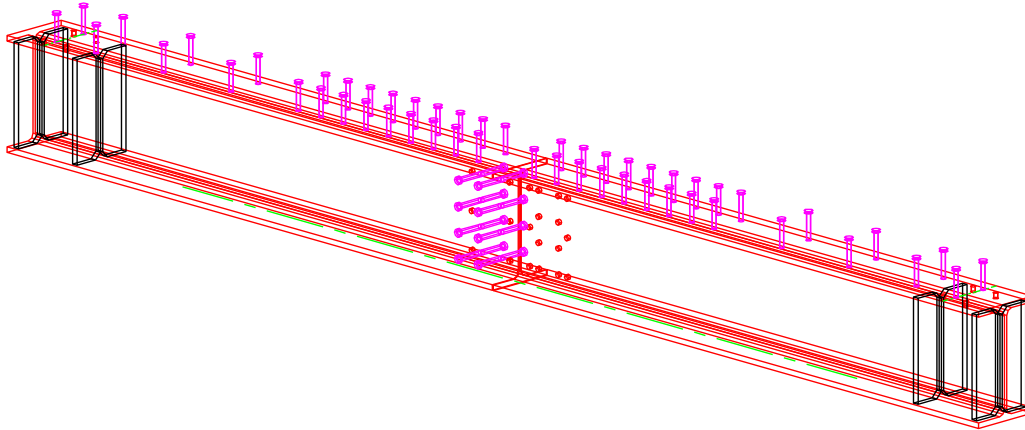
3D view of the steel part of the specimen. Web shear connection (joint C1) and predrilled holes for transverse bars (joint C2)
